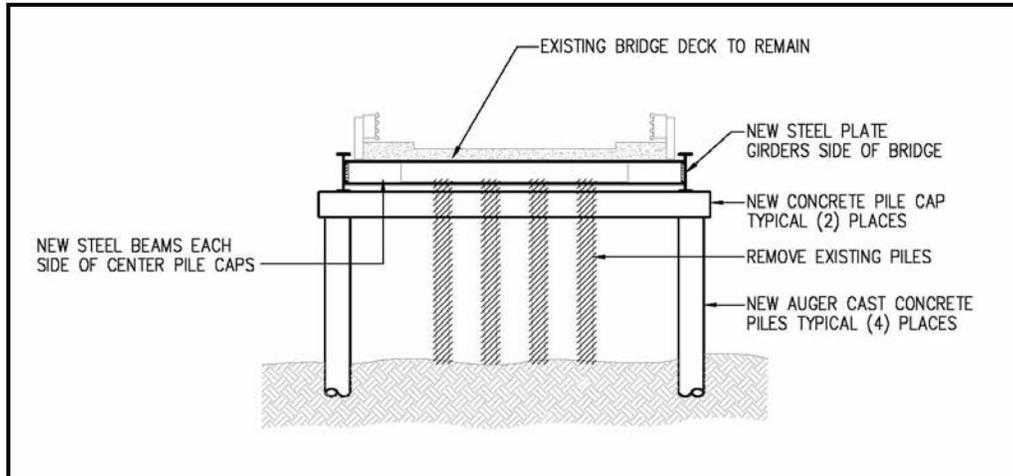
Conceptual Woodard Bay Drive Bridge Modification, Section View
